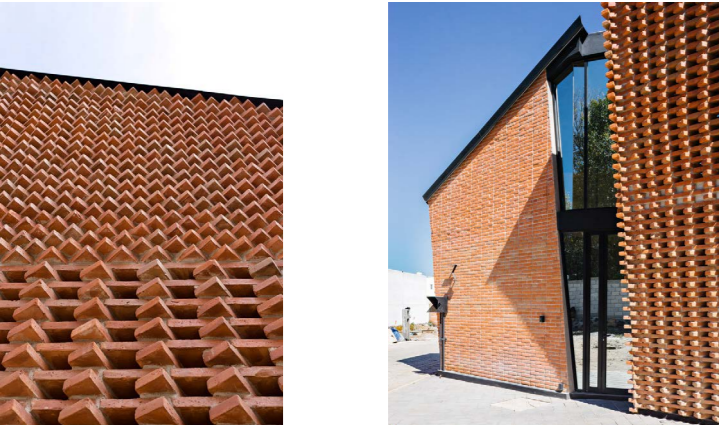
(Left) & Fig 5.15 (Right) Saint Peter House - Brise Soleil Details (ArchDaily. 2018)
